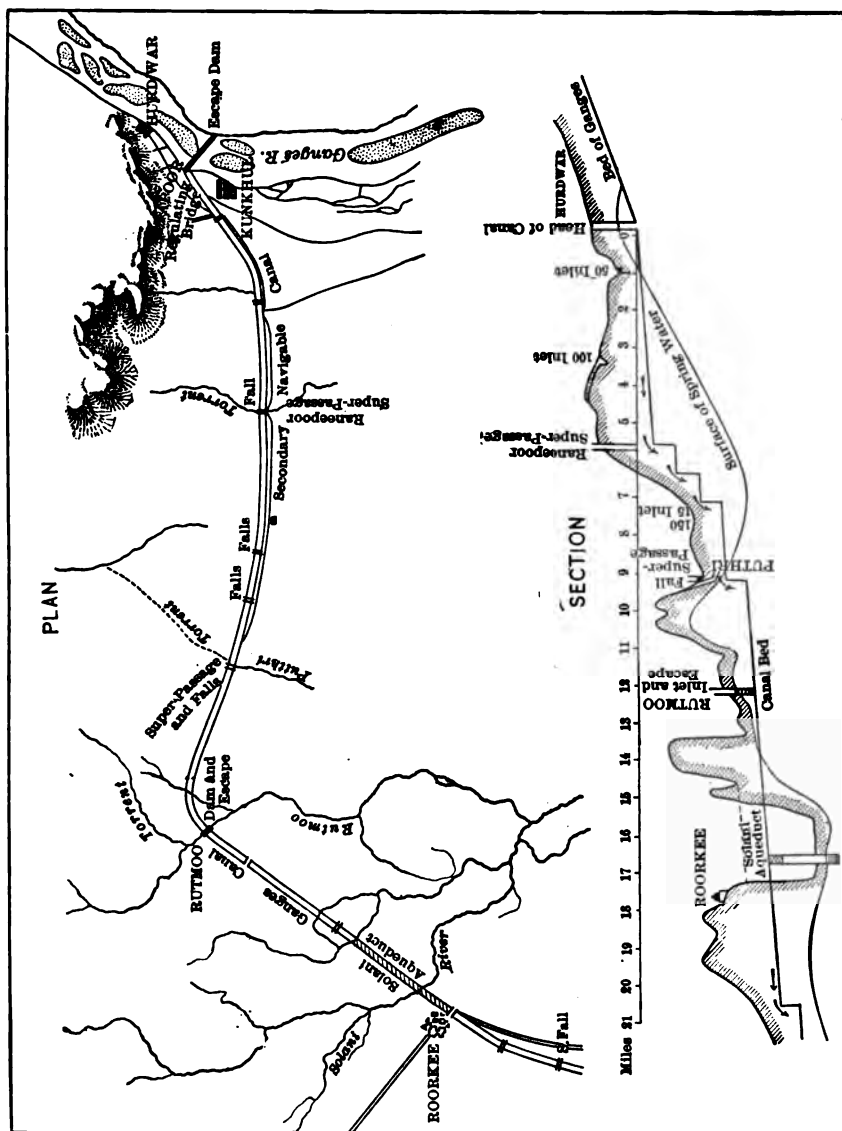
Plan and Cross-section of Ganges Canal, Hurdwar to Roorkee, India.
